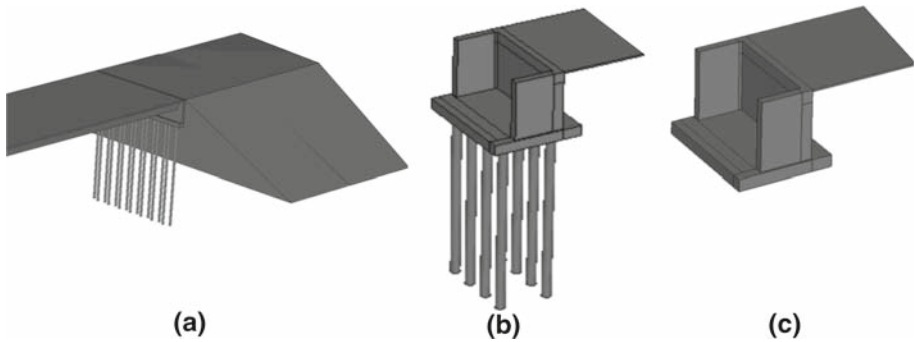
a Bridge abutment supported on earth embankment (assembly), b Stiff bridge abutment and c Abutment on shallow foundation
